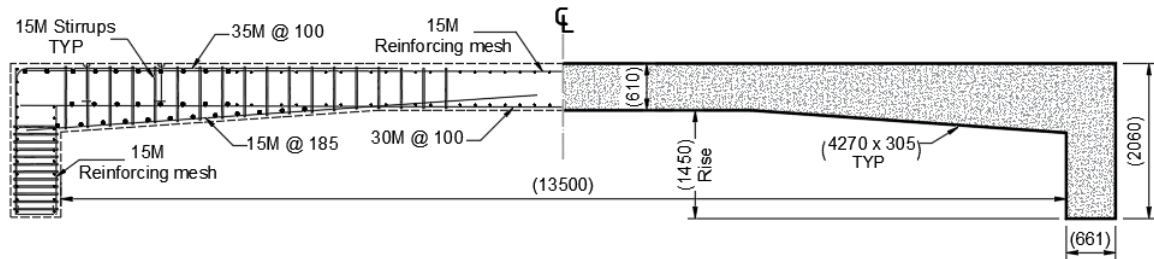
Geometry and Reinforcement details of the Oshawa culvert. (All dimensions are in mm)
